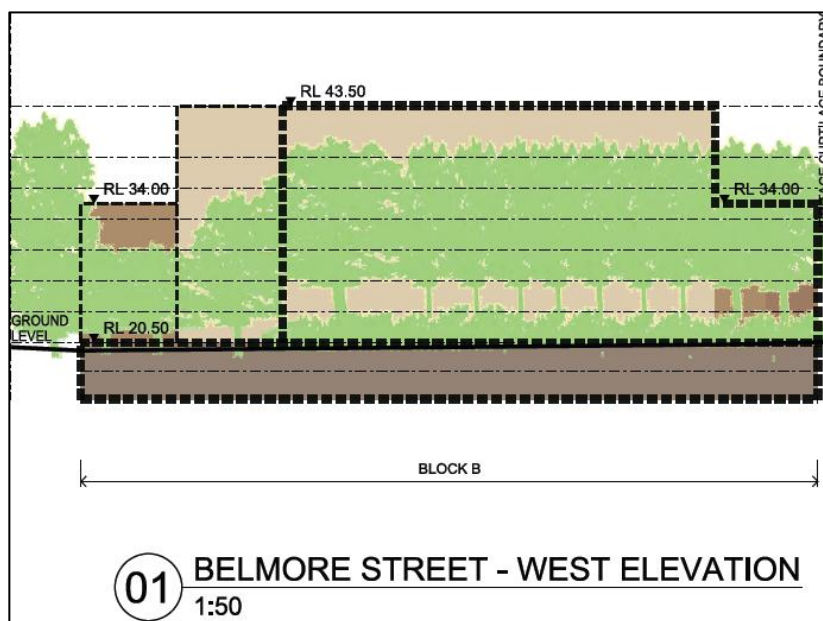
BUILDING B APPROVED ENVELOPE
